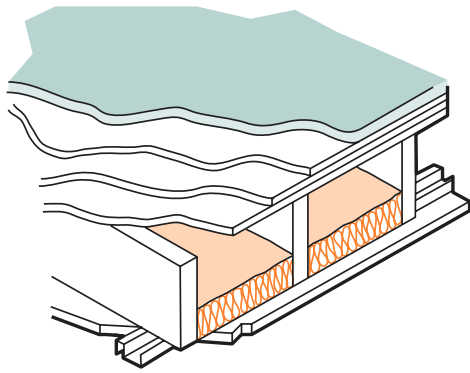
Floor/ceiling assembly with carpet and pad, particle board underlayment, plywood subfloor, resilient channels and gypsum board ceiling, with fiber glass insulation in joist cavities. STC = 53; IIC = 73.
